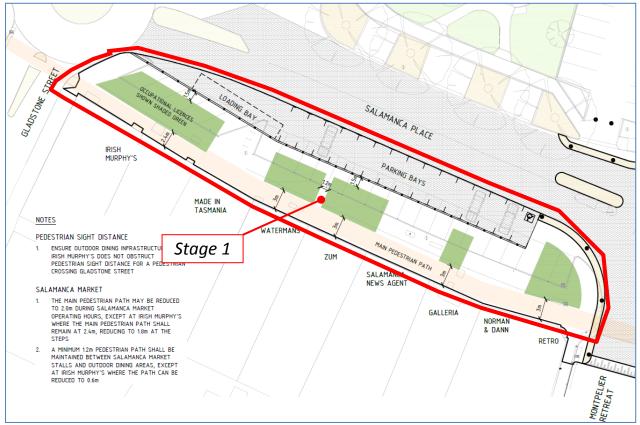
Salamanca Place Southern Footpath – Stage 1 Concept Plan
